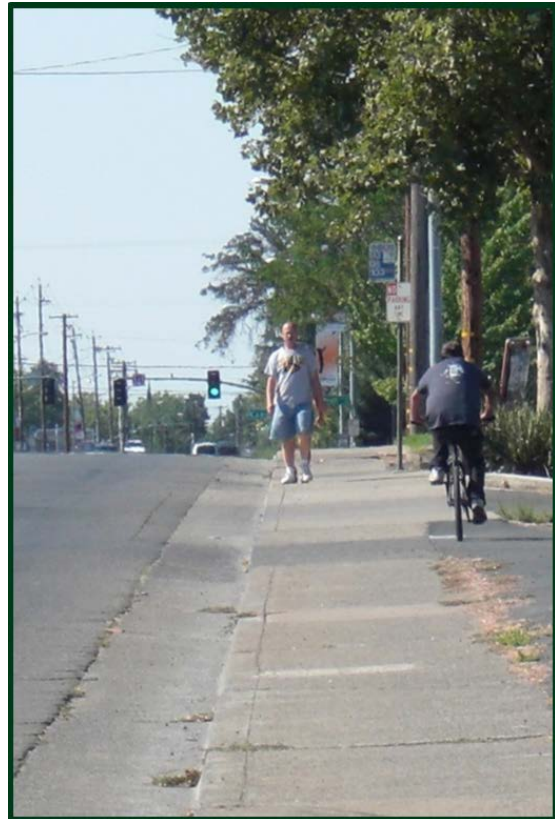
Before Construction No Dedicated Bike Lane, Non-ADA Sidewalk
